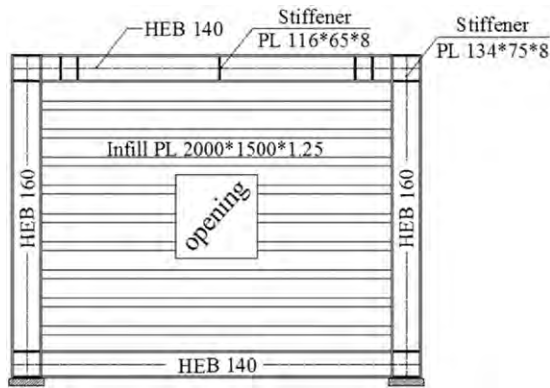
Details of a typical trapezoidally-corrugated and centrally-perforated SPSW model.
